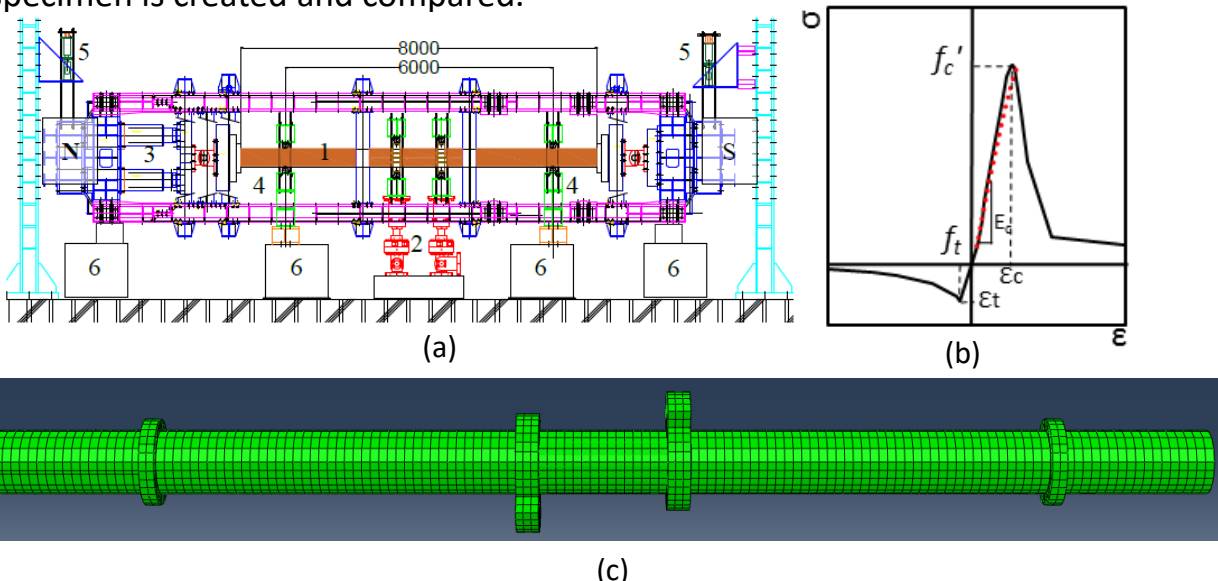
(a) Pile loading system at Building Research Institute, (b) Concrete material model and (c) Finite Element Model of the same pile specimen
